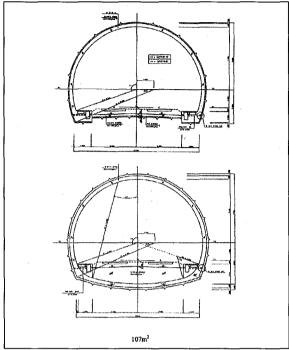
Typical Sections for Double-Track High Speed Rail Tunnels in Korea
